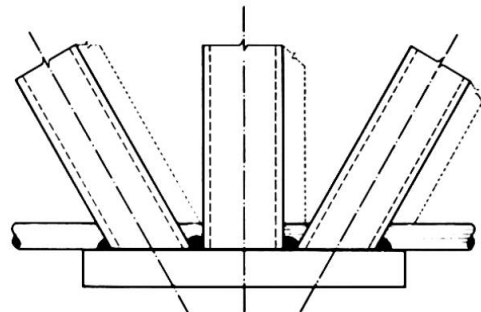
Detail of a Lower Bearing Node (Sketch)
